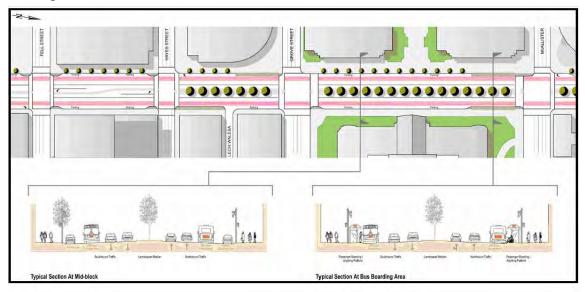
Preliminary Plan and Section View of Alternative 2
